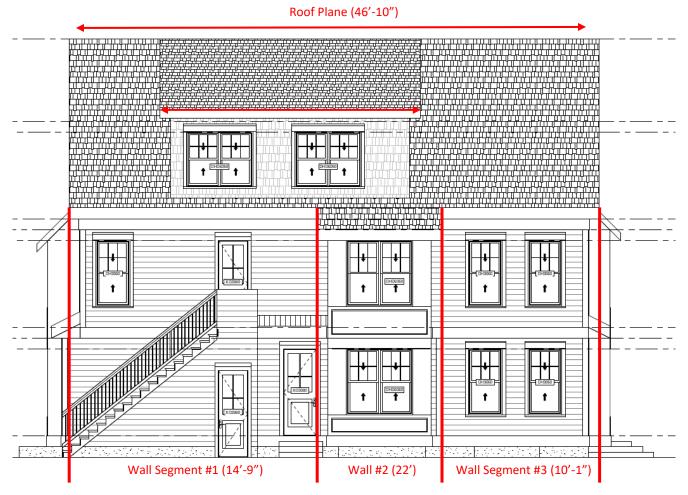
A proposed building elevation with a dormer that exceeds 50% of the length of the exterior walls of the story beneath, which is calculated as 3 individual segments, based on ISD's current interpretation
